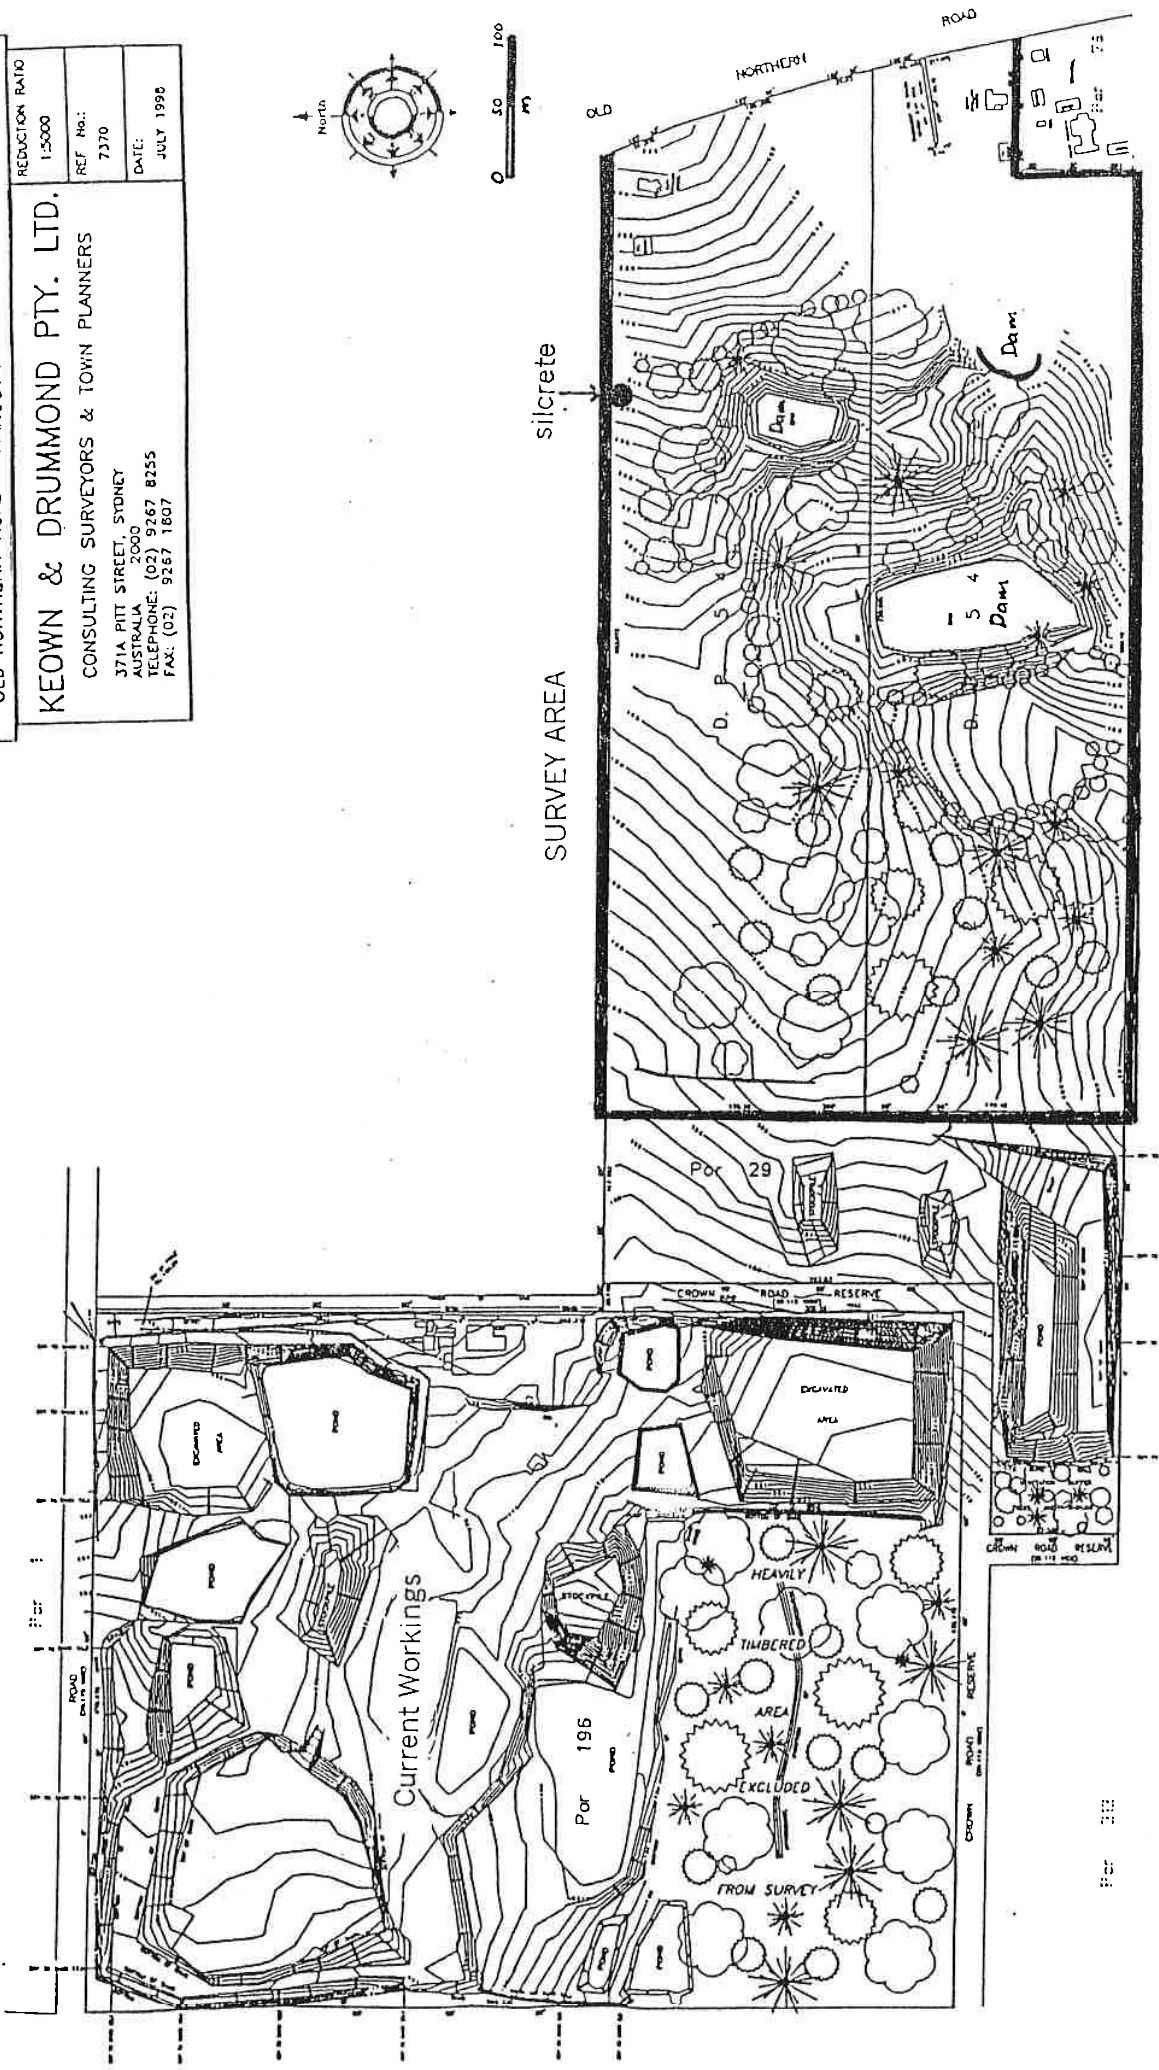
General Site Plan (dark outline). Source: Lyall & Macoun Consulting Engineers.
